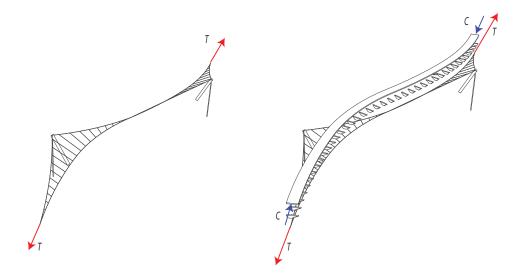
Priciple equilibrium of forces in a cross-section of the bridge
